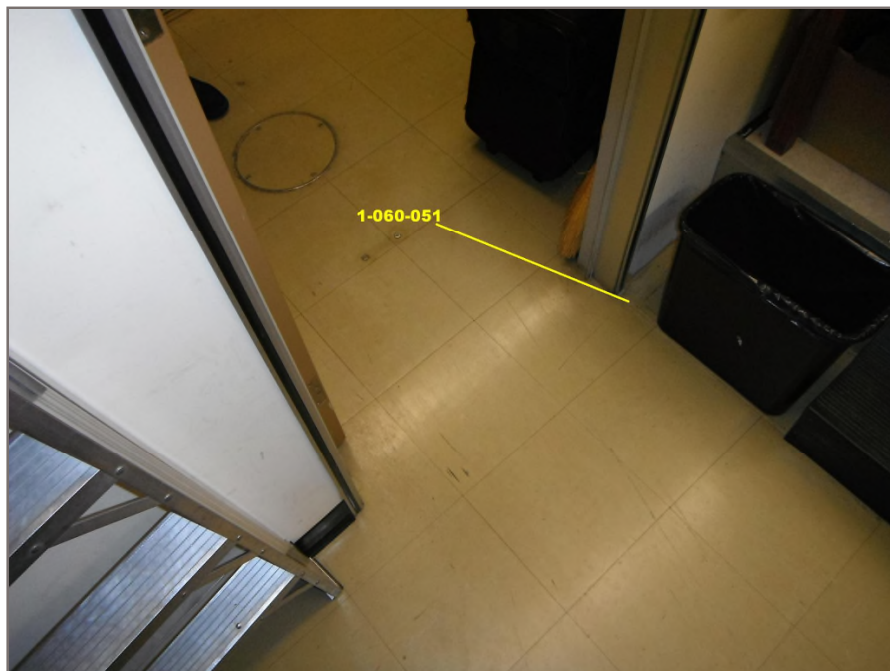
Asbestos-containing 12"x12" greenish vinyl floor tiles within a first floor office. Tetra Tech sample 1-060-051.
